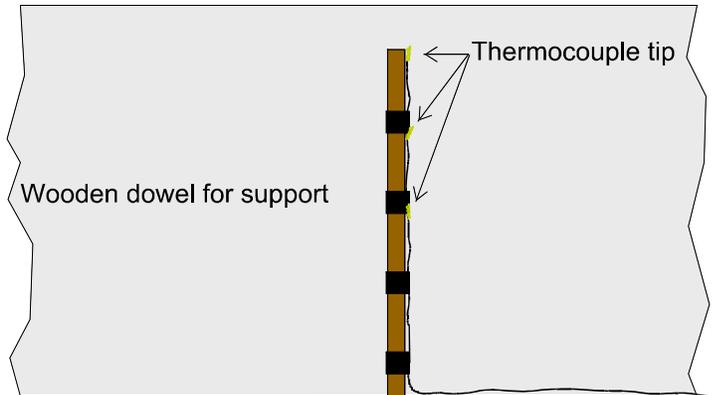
Diagram of Thermocouple as Oriented in Cross-section of Pavement.
